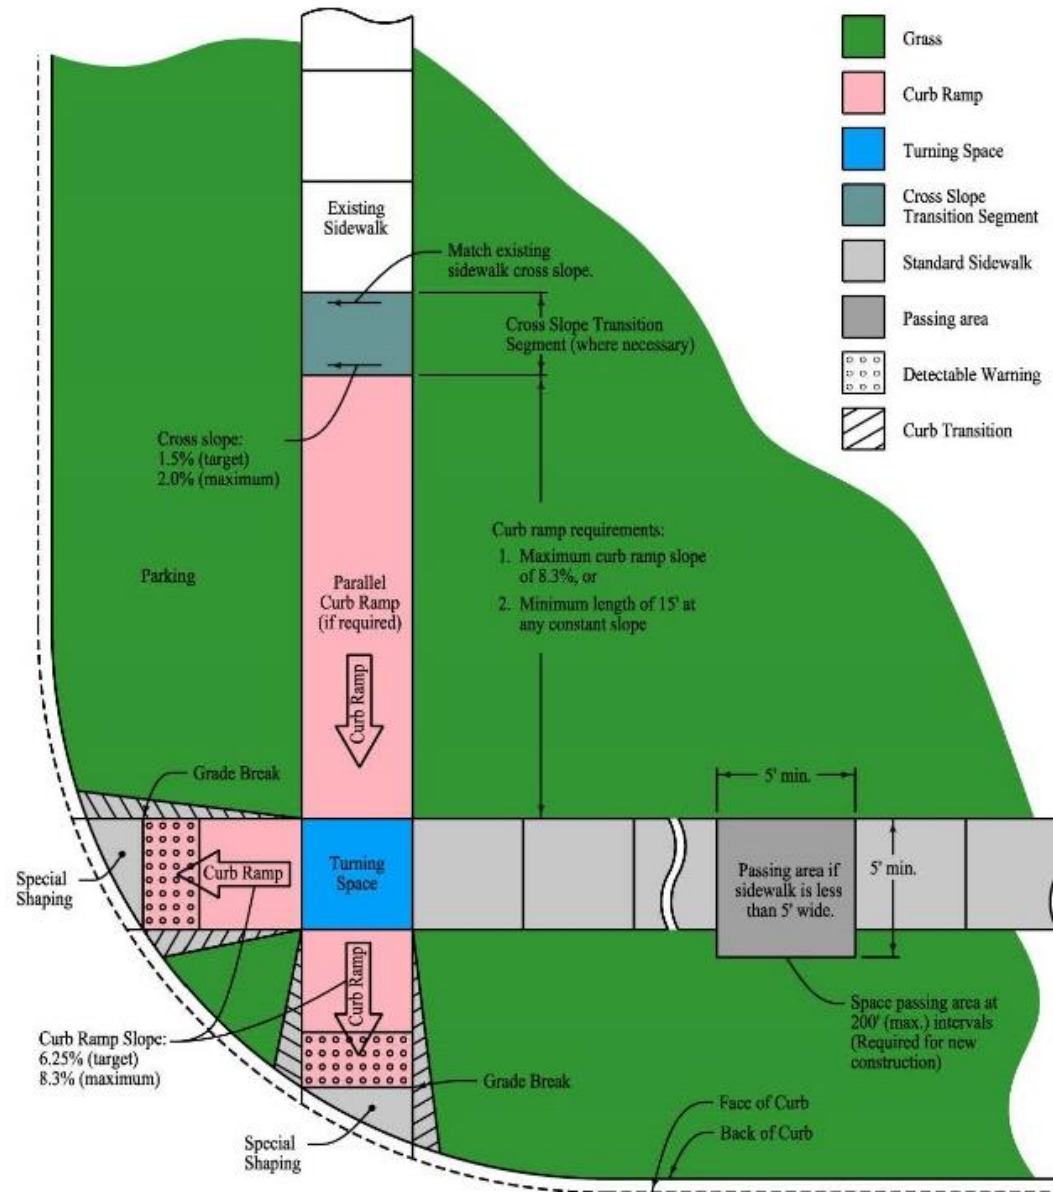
A-2.03: Standard Sidewalk and Curb Ramp Elements
